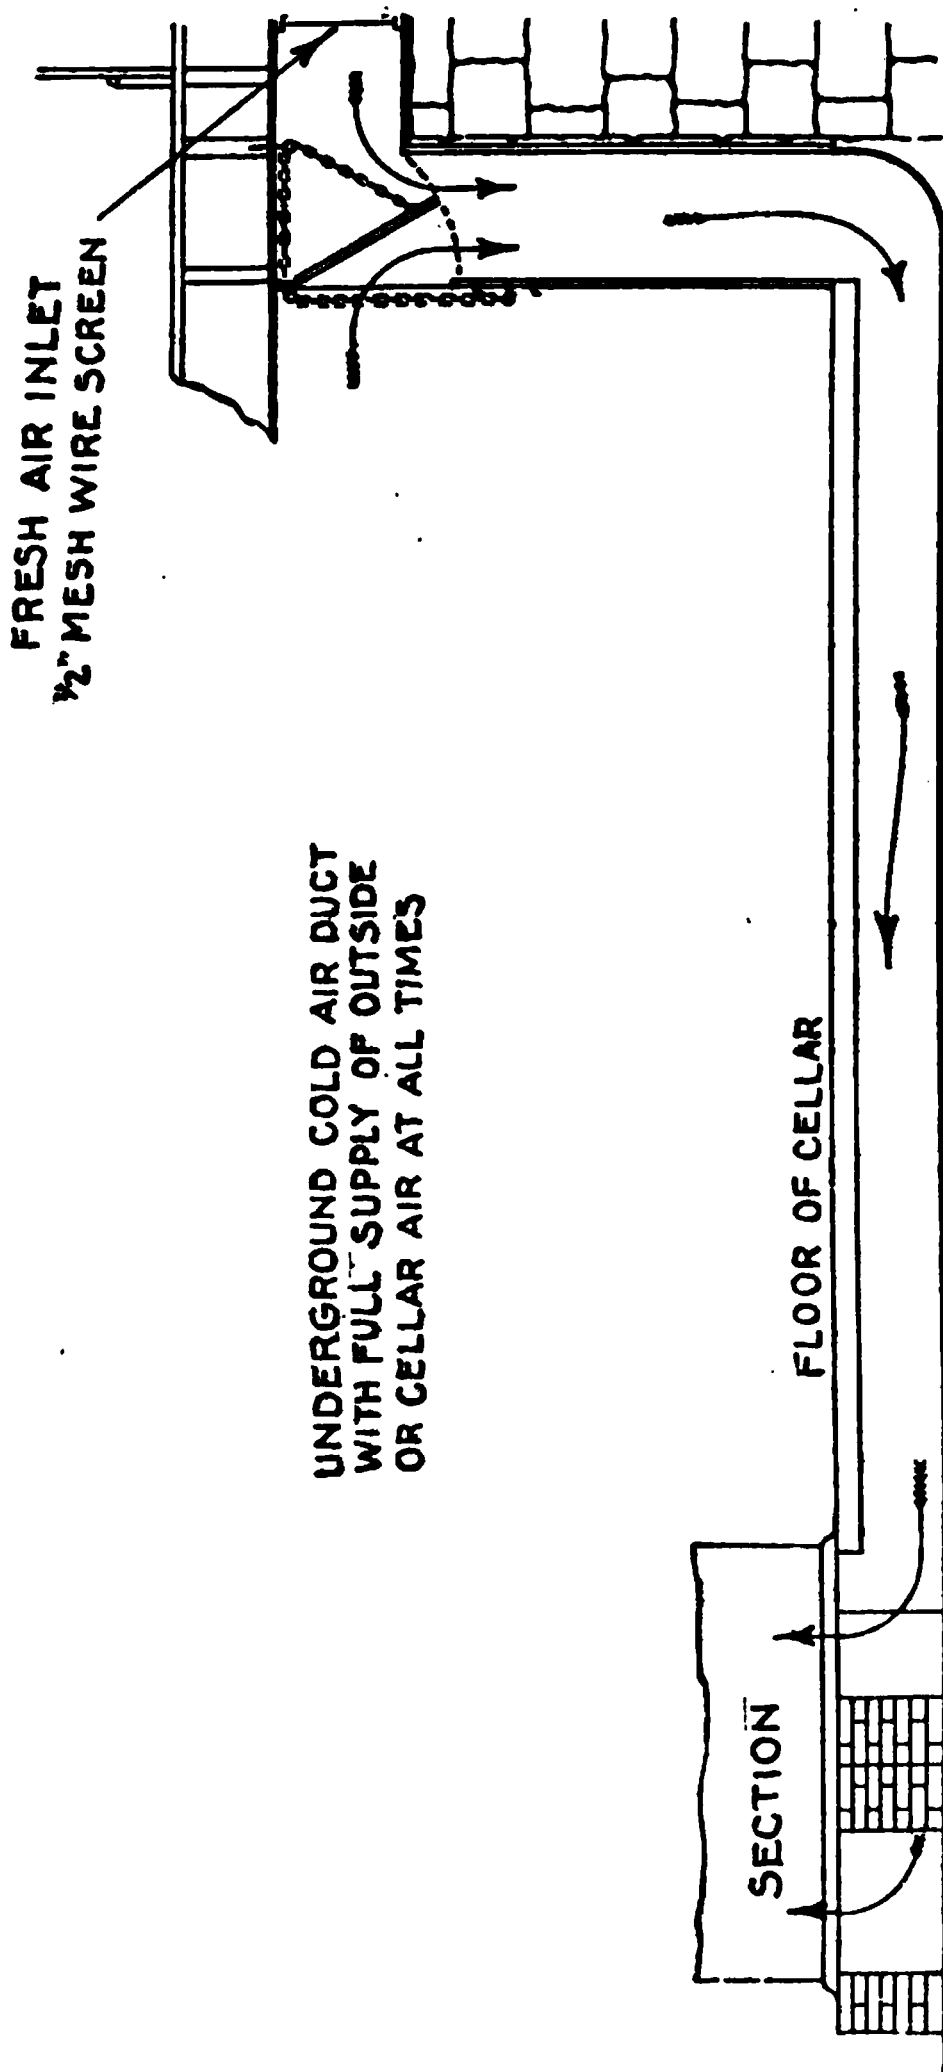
,477.—Proper method of installing cold air box in connection with duct when air is taken from cellar and from outside the house.
